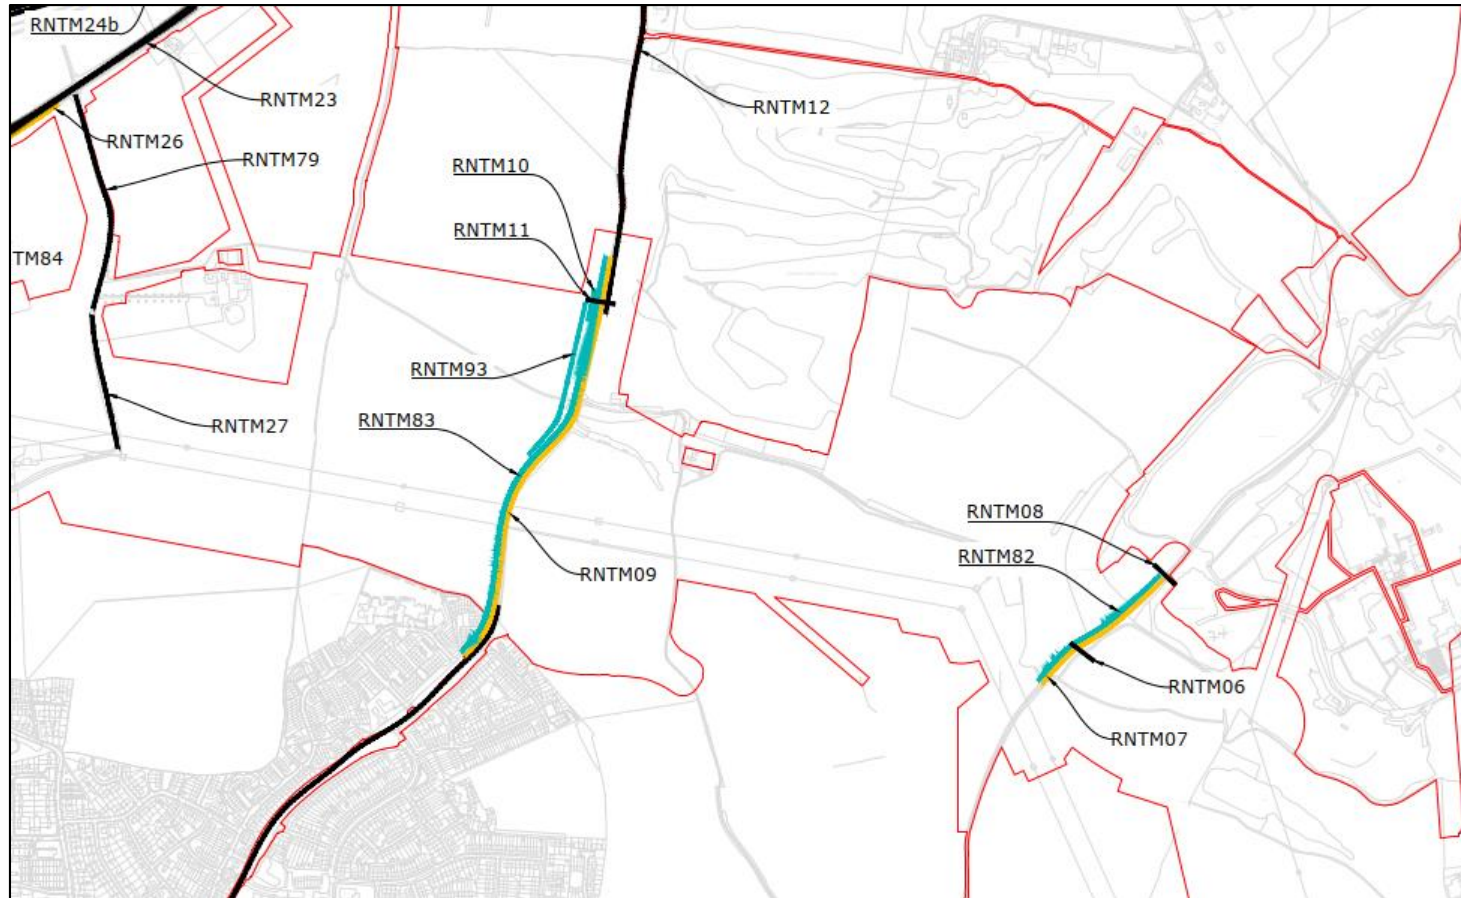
Roads North traffic management measures location plan (3 of 8)
